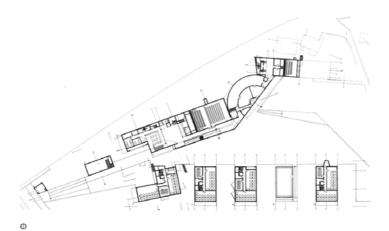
School of Architecture plan. Tower H is on the right lower corner.
